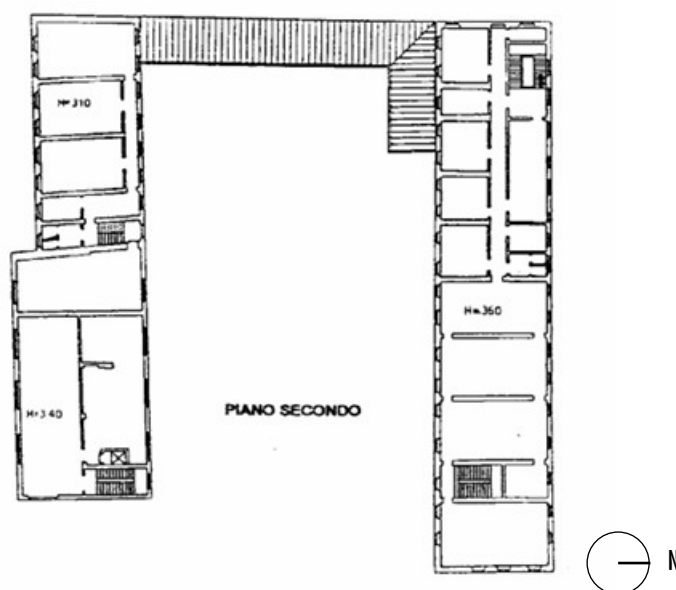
Floor plan of the second floor of Sisters' House I,II, and laundry room.
